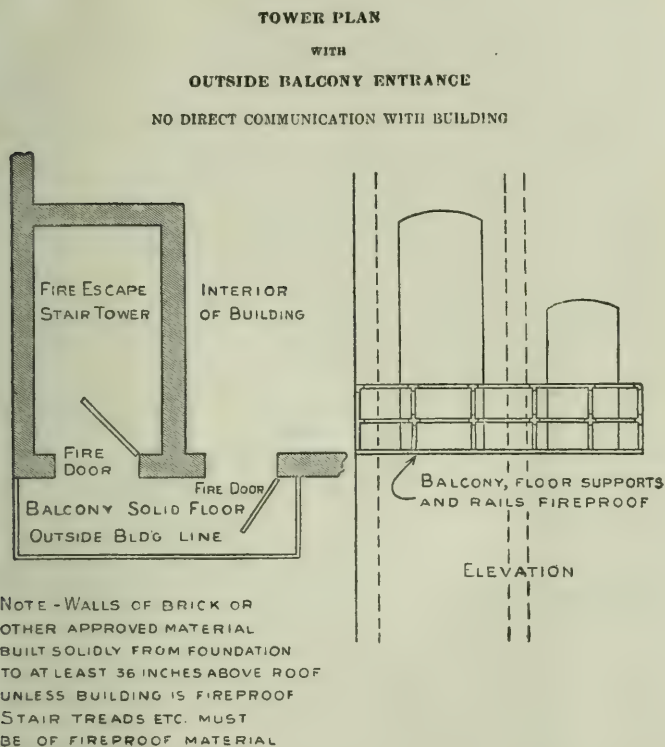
Fire Escape Stair Tower with Exterior Balcony Entrance.
